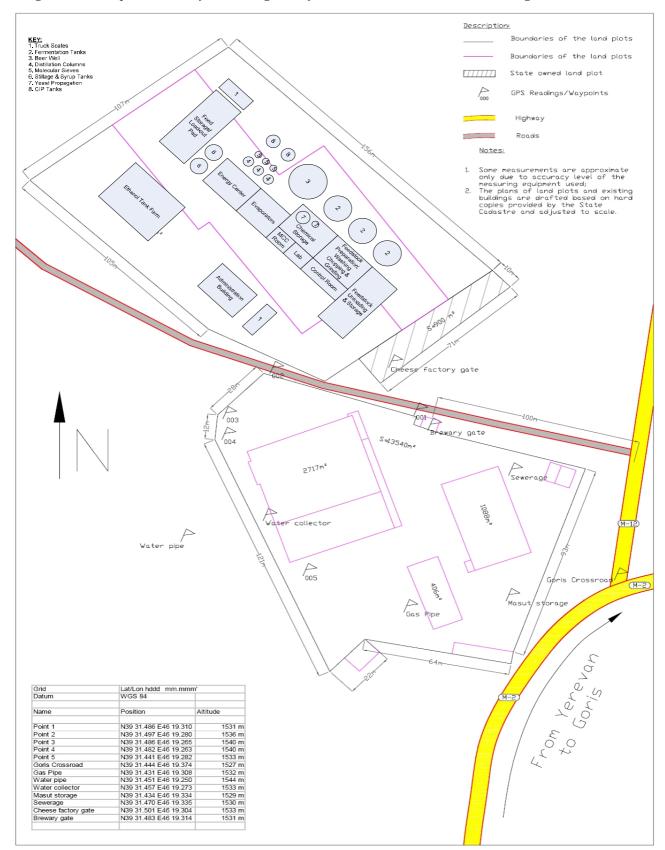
Proposed Site Layout Arrangement for a Jerusalem Artichoke Processing Plant at Goris
